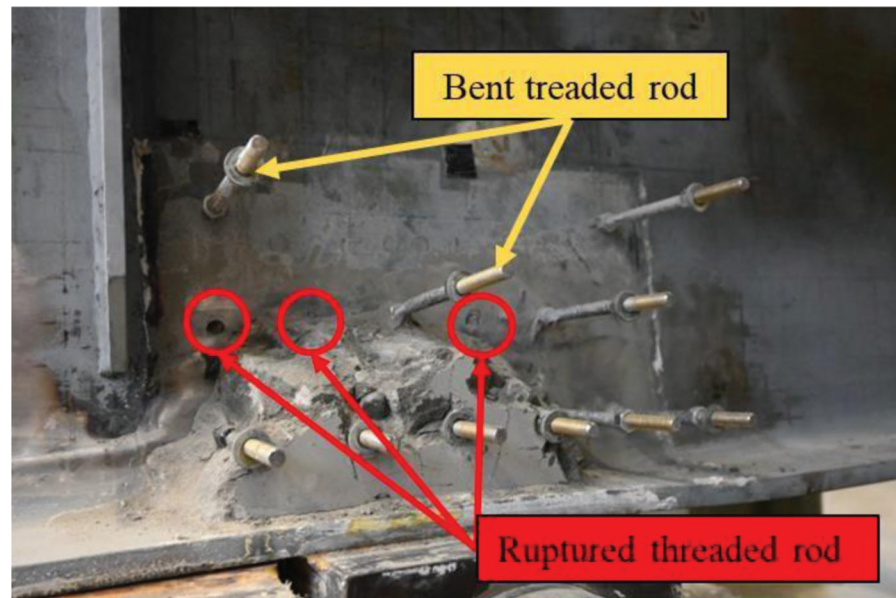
Specimen 4: threaded rod deformations (grout panel removed).
